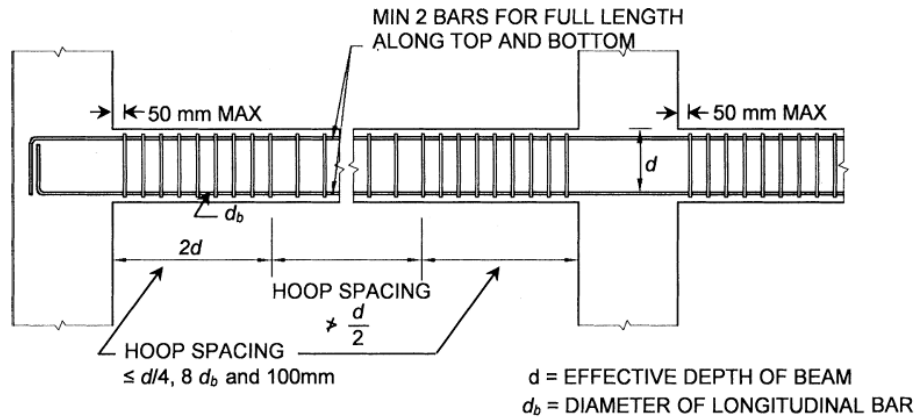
DETAILS OF TRANSVERSE REINFORCEMENT IN BEAMS
